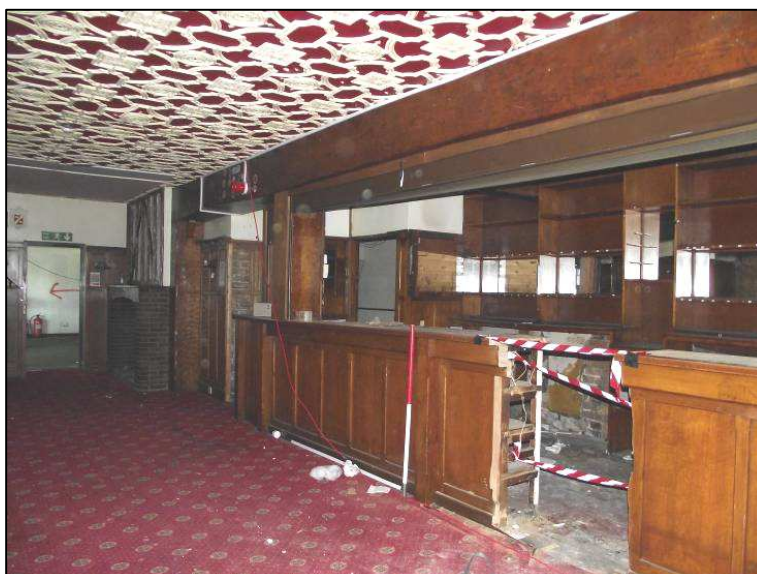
(Shot 39): Dining rooms in northeast portion of ground floor, looking east- northeast
